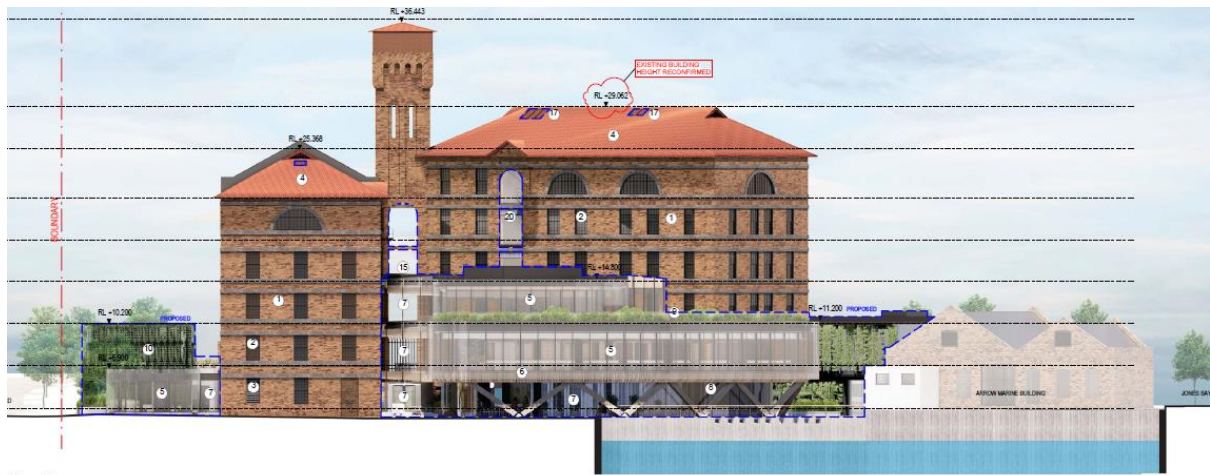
Proposed north elevation, including proposed works to Building D (D/2021/1507)
